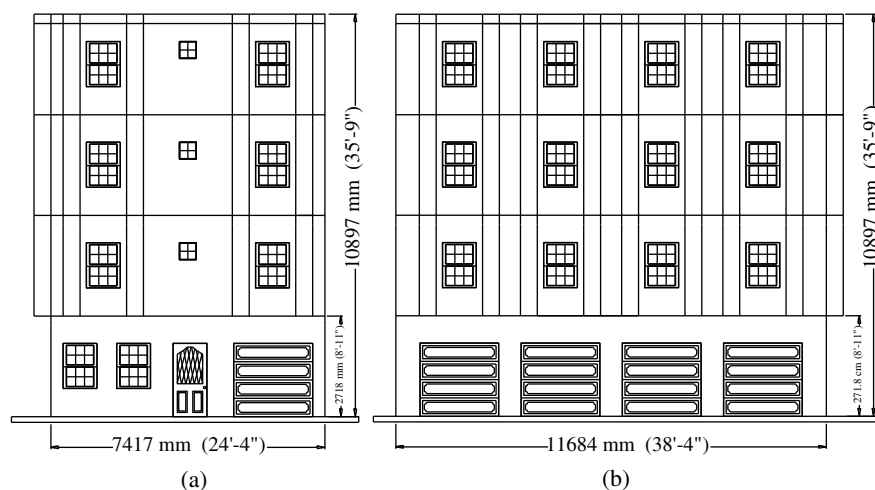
Elevation views of the test building: (a) east view; (b) south view
